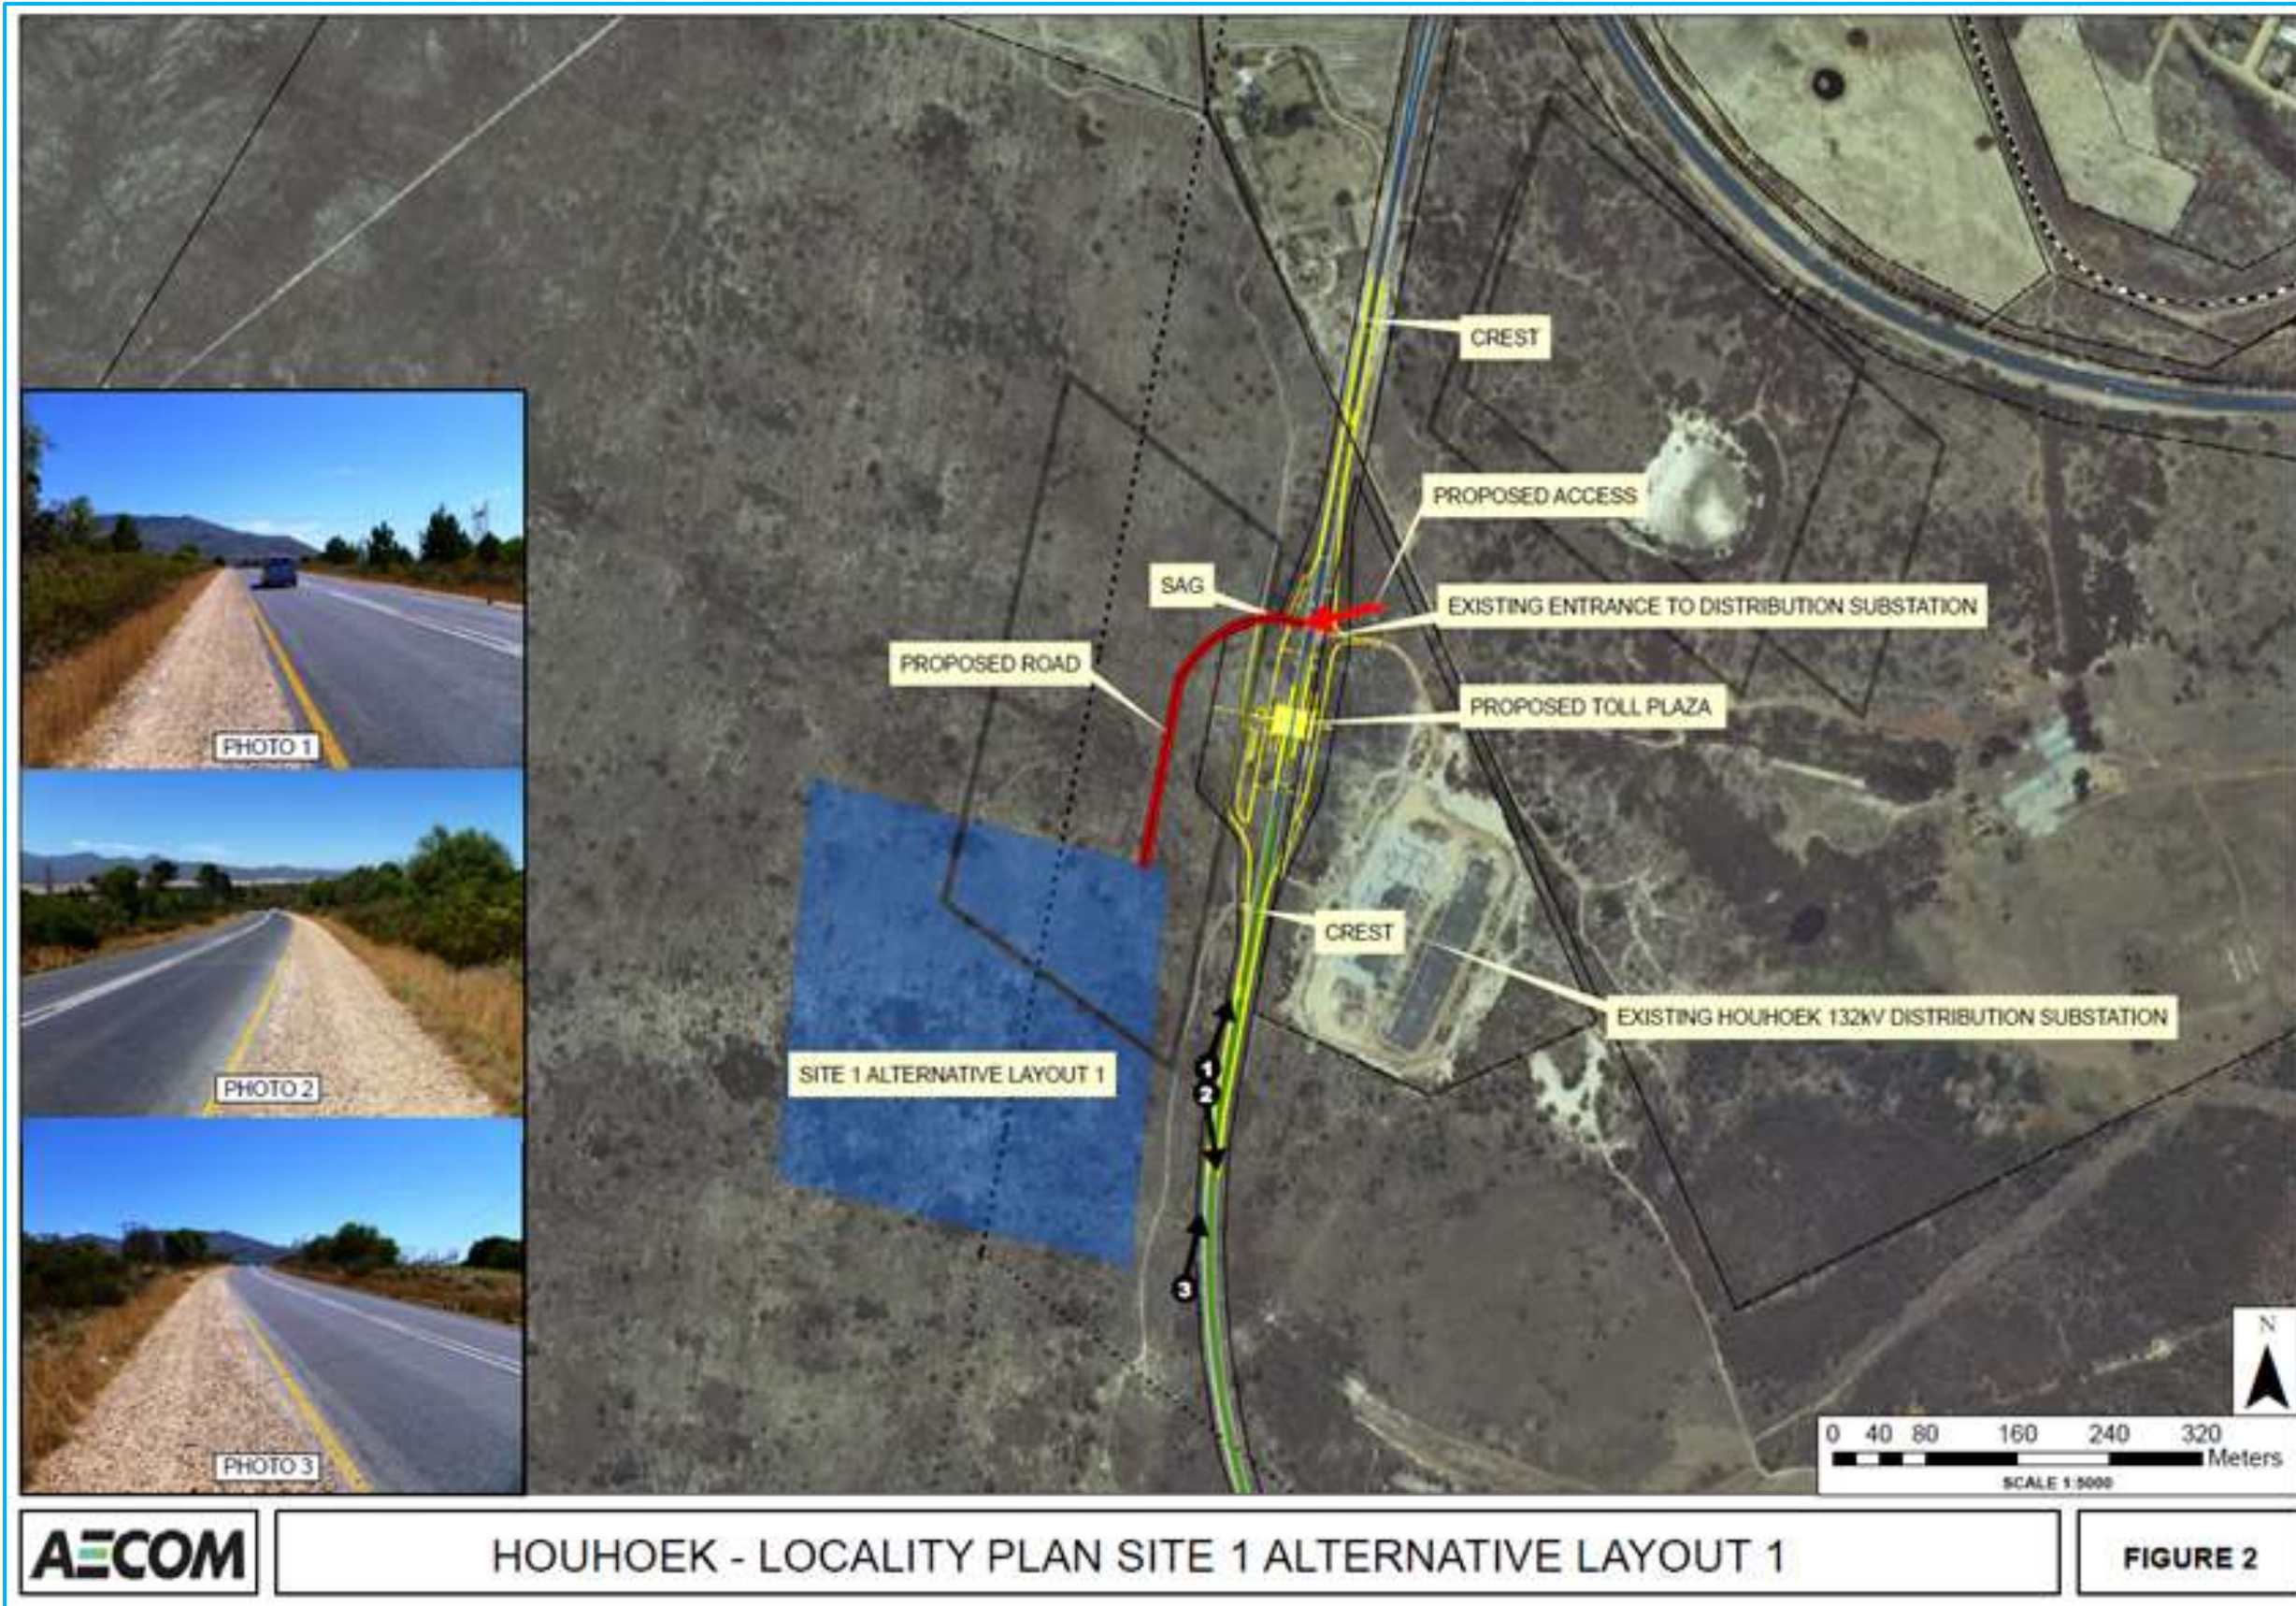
Planned Road Infrastructure Improvements at Site Alternative 1: Layout Alternative 1
